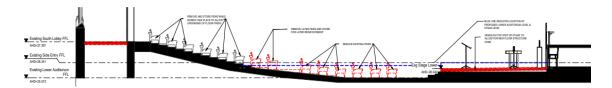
Demolition Section of the Auditorium. Blue line indicates line of proposed raised flooring and stage. Source: Trethowan Architecture, 2024.
